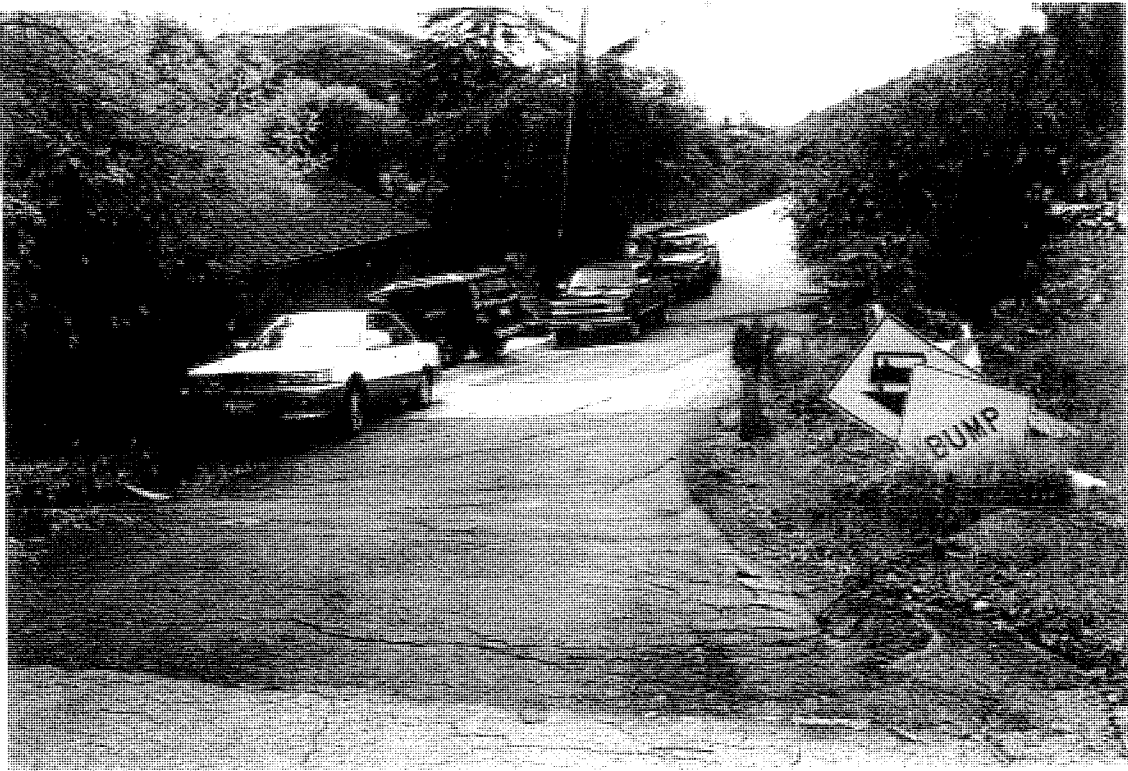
Looking south near 10 Ealand Place across Slide Mass C lateral scarp, 1/13/05.
